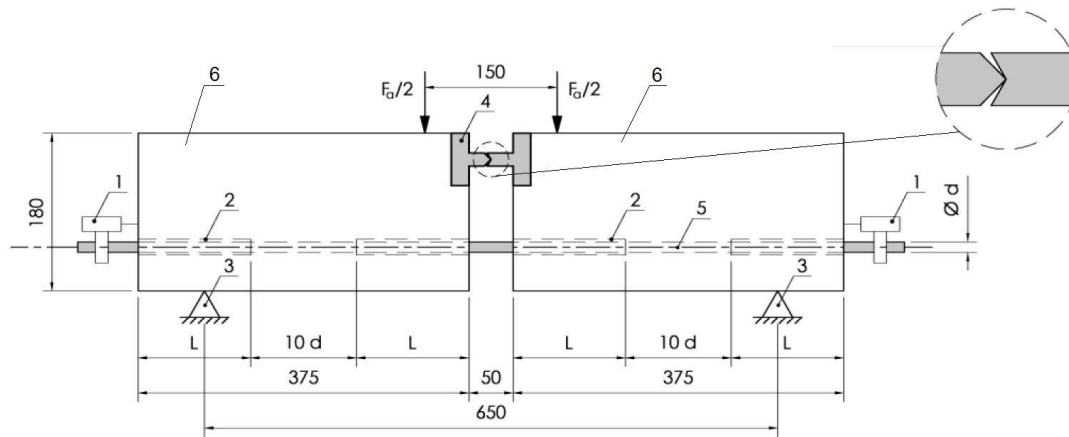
Rig for testing an adhesion of a reinforcement bar with use of the beam method [7]
